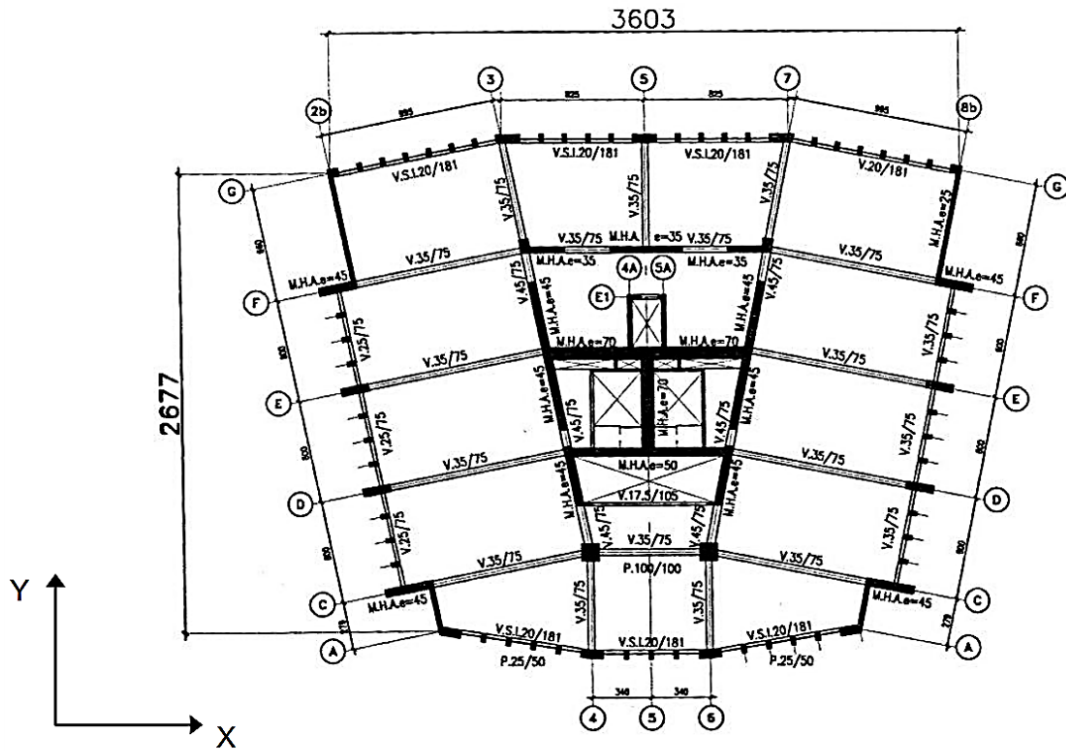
5<sup>th</sup>-8<sup>th</sup> floors structural details. CChC Building [5].
